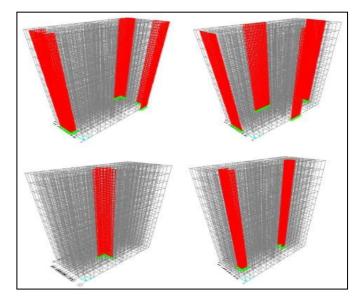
Building model with shear wall provided along the corners, at centre, across periphery and around core walls
